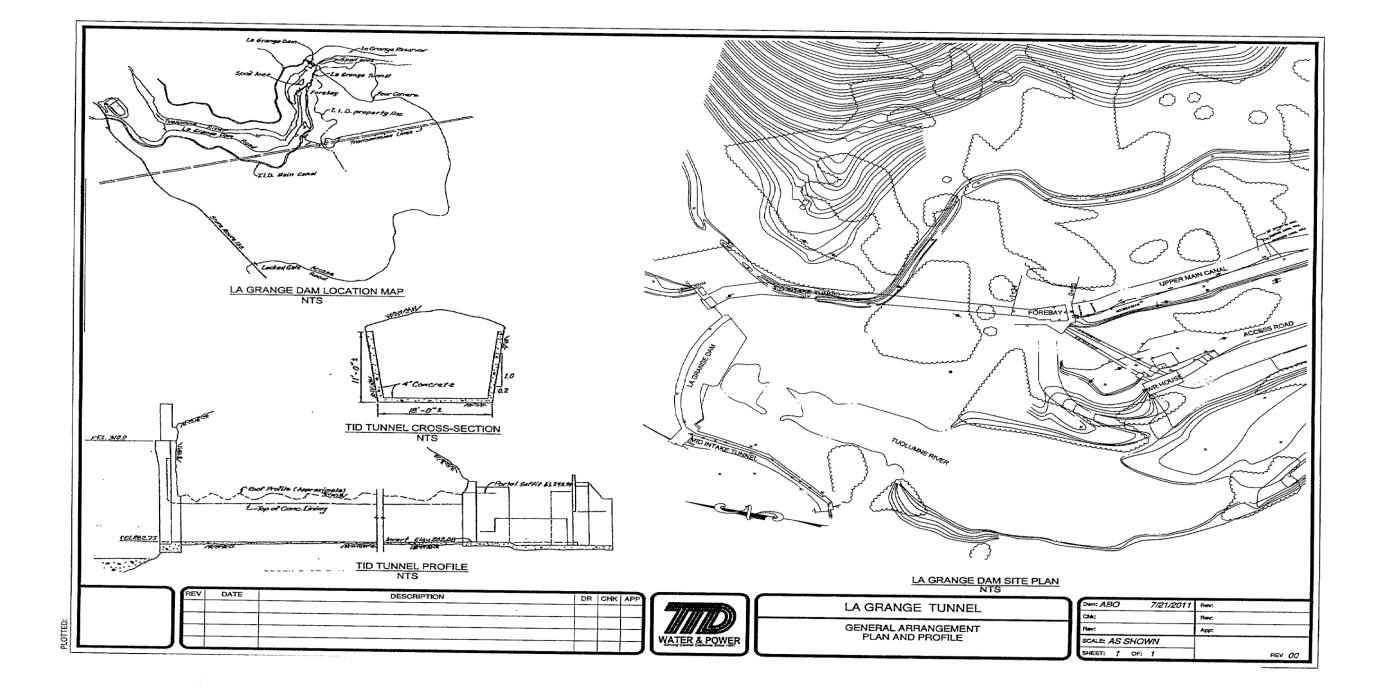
Site plan of La Grange diversion dam and facilities showing diversion dam, TID tunnel intake, tunnel location, penstocks, powerhouse, and Upper Main Canal.
